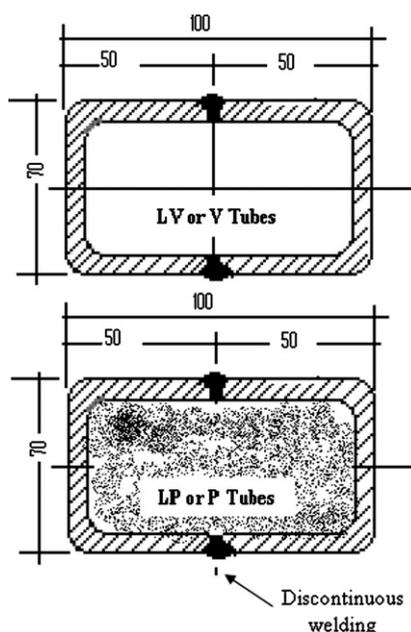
Thin cold formed and welded steel cross section details.
